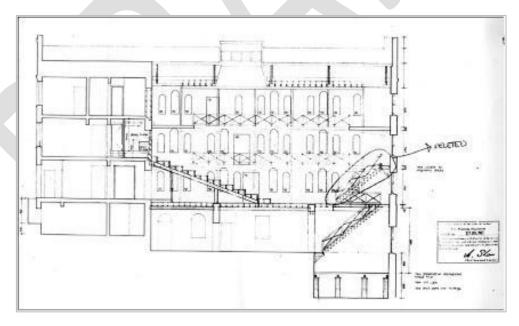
Long section indicating the proposed 1980s works to convert the building into the Marionette Theatre. (Source: City of Sydney Archives 539/1/82)
